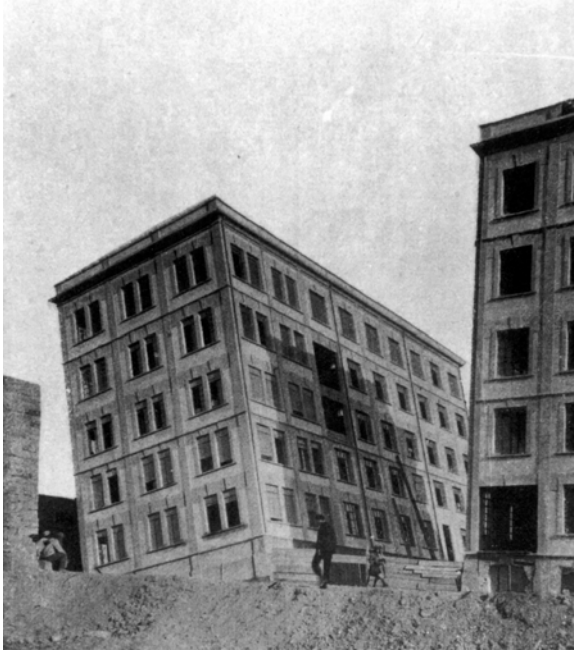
Uneven settlement of building demonstrates monolithic strength of the Hennebique reinforced concrete construction system. Mill building, Tunisia, 1906. (Delhumeau et al.)
